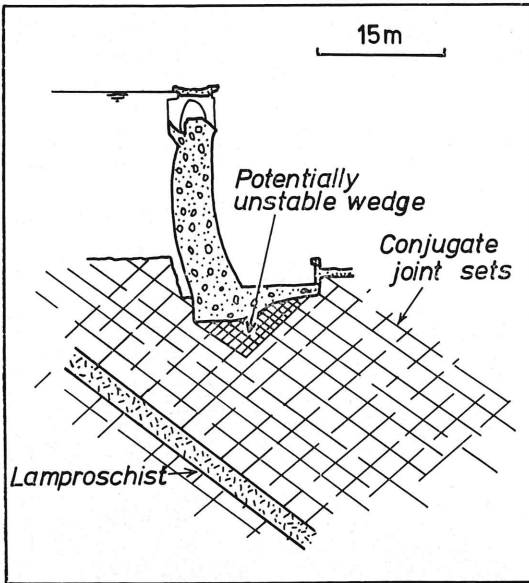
Section through foundations of Monar Dam illustrating conjugate joint pattern and lamproschist dyke.
